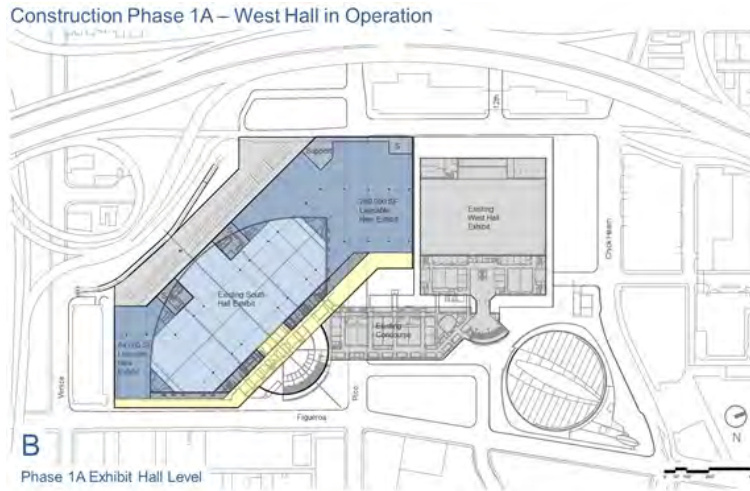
Scheme B – exhibit hall level (construction phase 1A)
